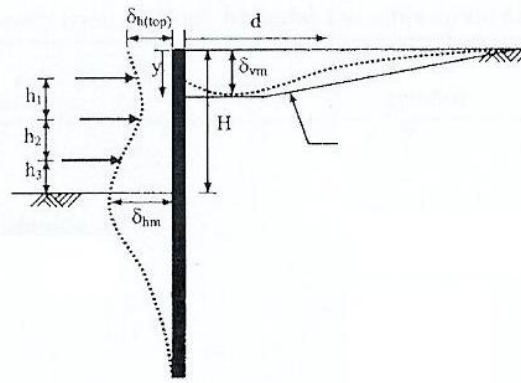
Typical profiles of wall and ground movement for anchored wall. Adapted: Leung et al, 2007.
